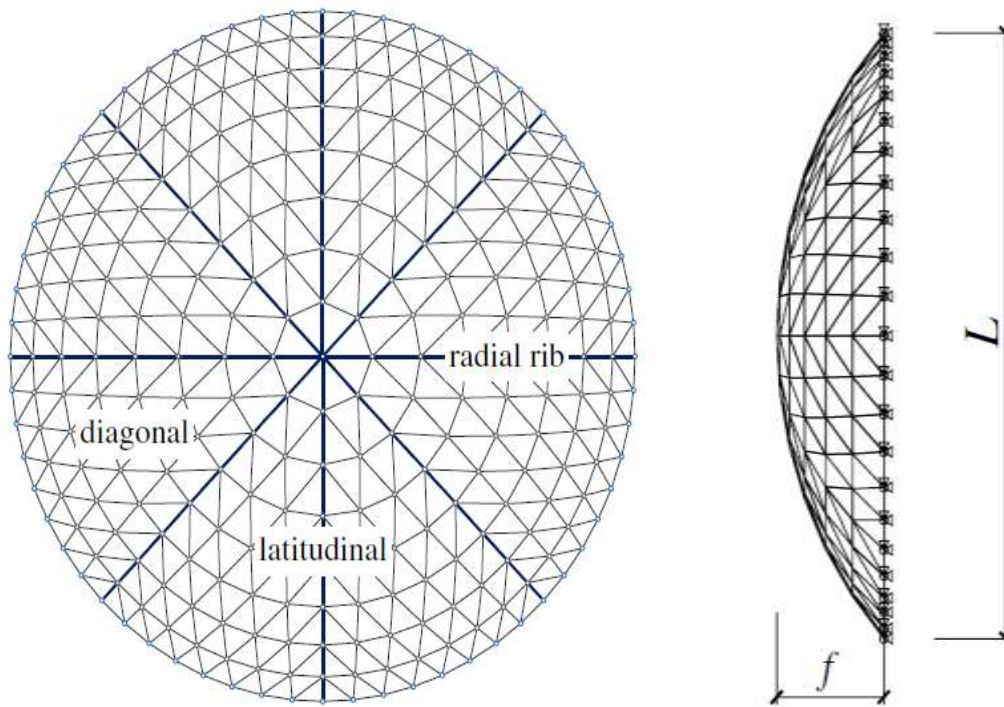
Typical Floor Plan and Elevation of reticulated dome
